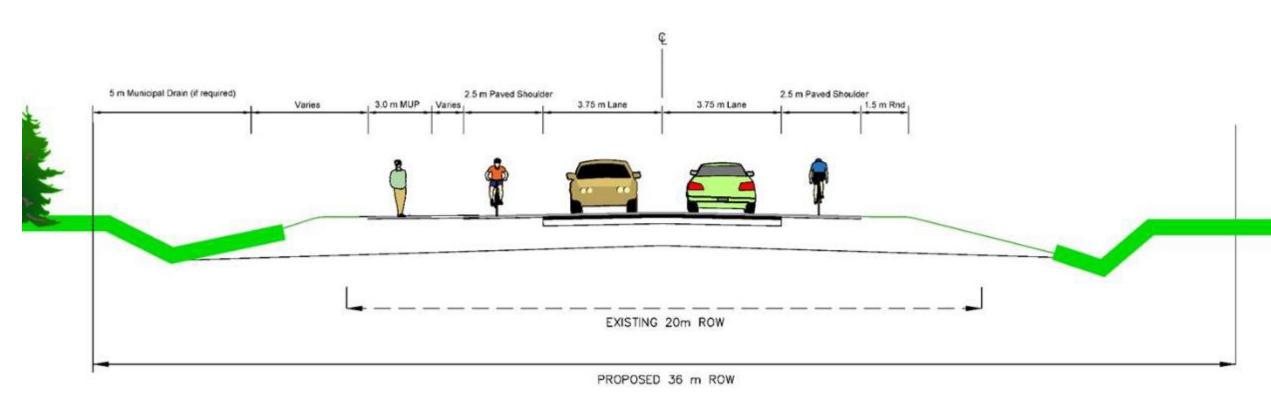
Concession Roads 8 and 9 – Alternative 1 - 2-Lane Rural Cross Section with Bike Lanes and a MUP
